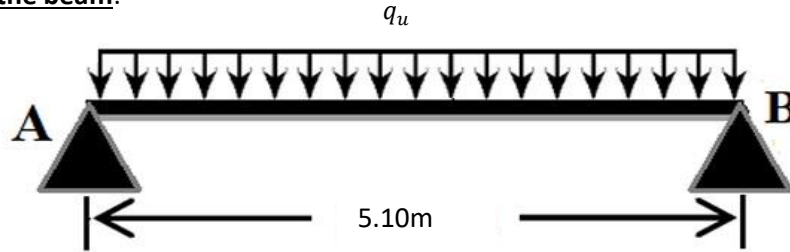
STATIC DIAGRAM OF REINFORCEMENT BEAM 1
